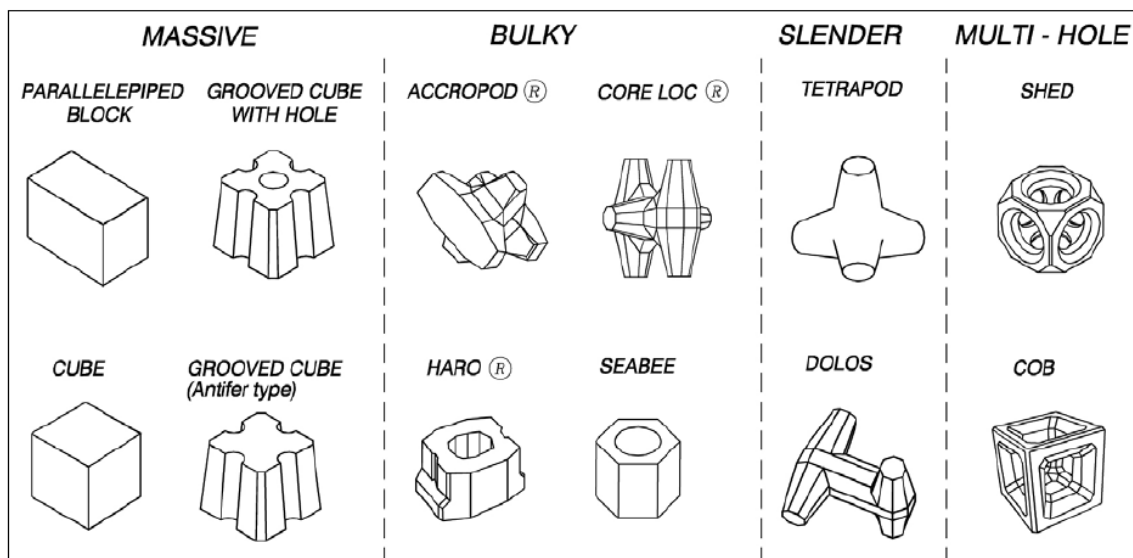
Examples of concrete armour units (CEM, 2006).
